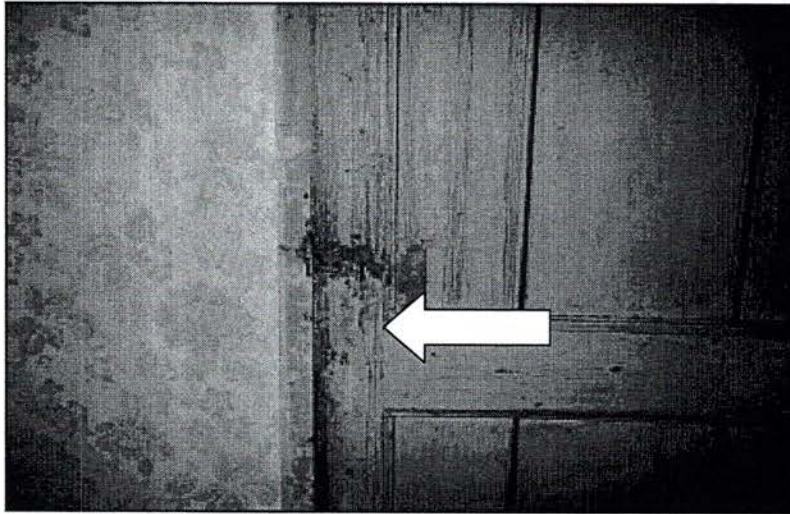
Ghost of Suffolk latch on recycled, hand planed, board and batten door to Room 208.
